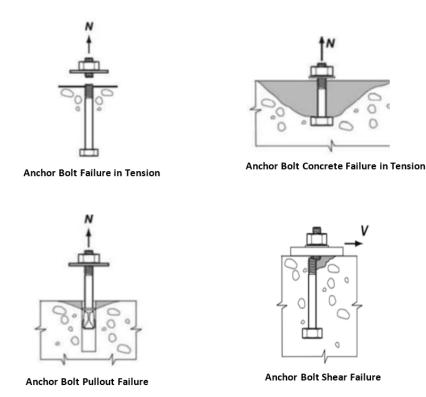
Anchor Bolt Failure Modes [5]
